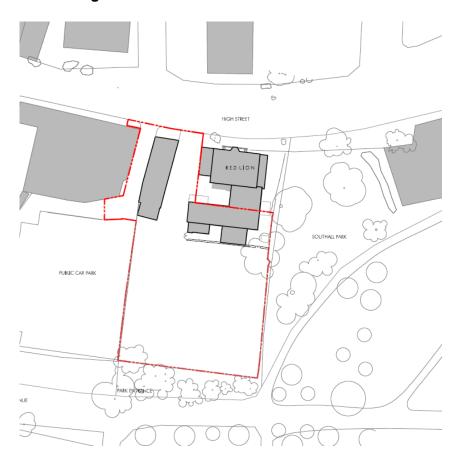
Site Location to the rear of the Red Lion public house and 94 High Street, Southall
